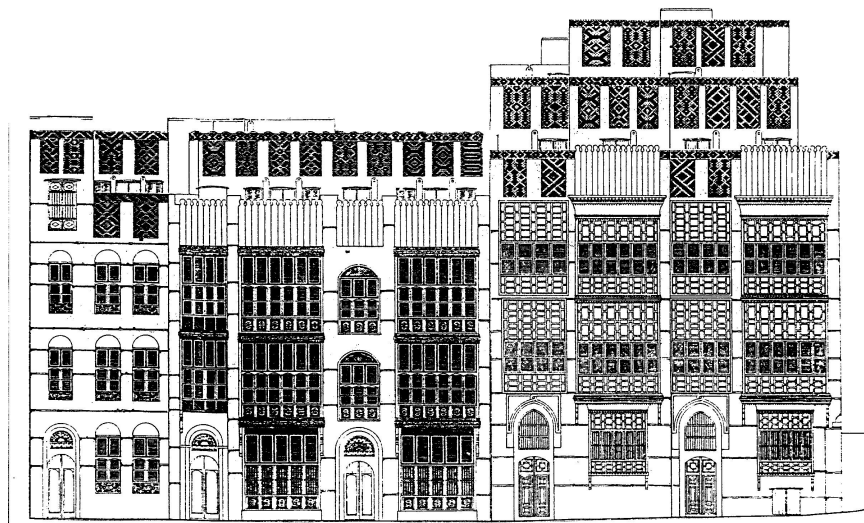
Exterior elevation of a house in Mecca (Ragget 1998, p.209)
